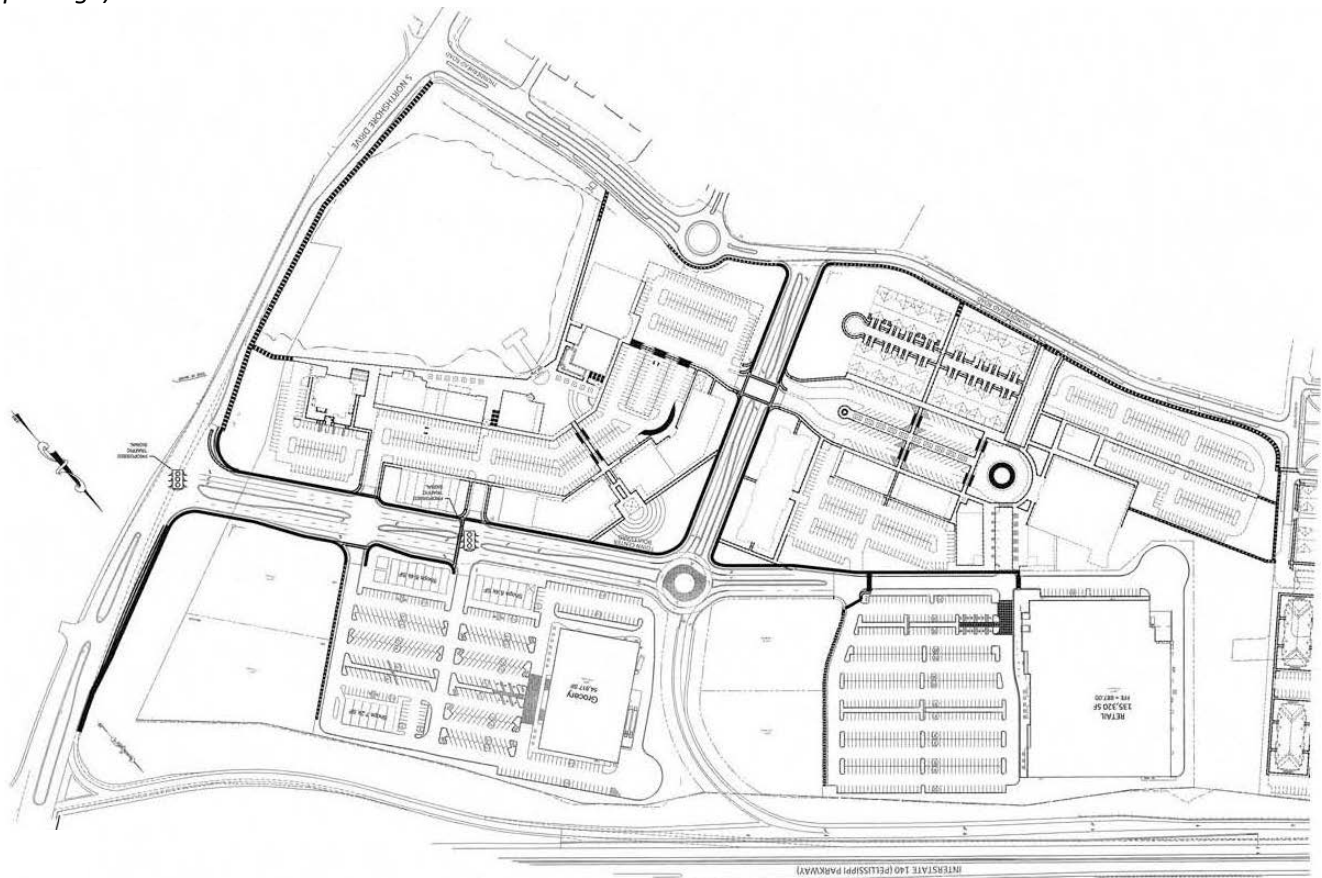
2011 Phase II Pedestrian Site Plan (site plan showing buildings more clearly was not a part of the package).
